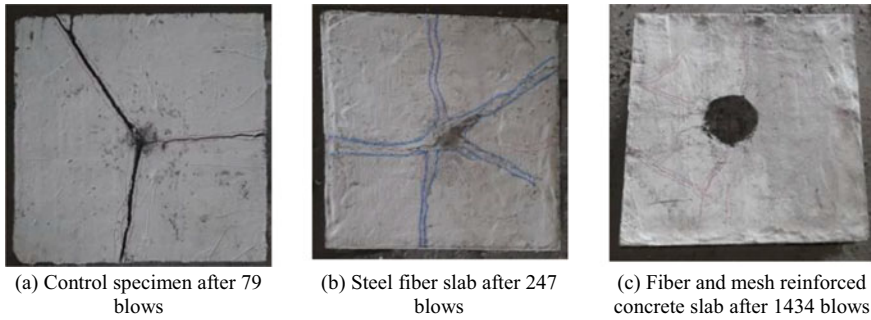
Failure pattern of steel fibre and mesh embedded concrete slabs
